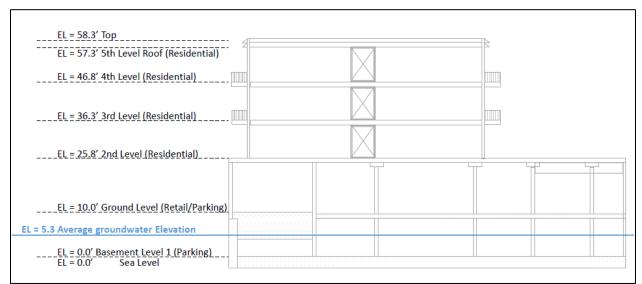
Proposed building geometry and elevations for 138 Culver. The average groundwater elevation is based on the data shown in Table 1.
